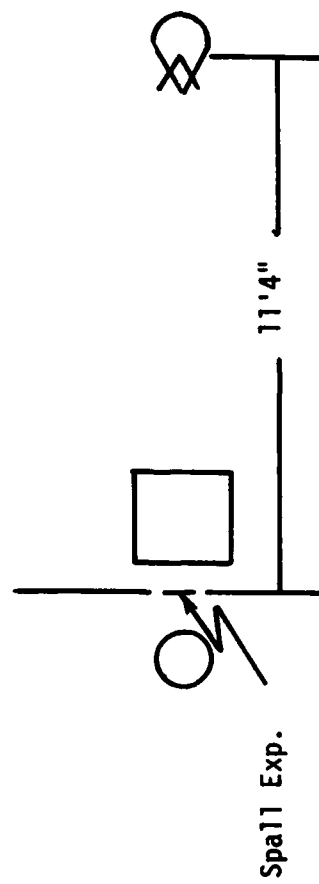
Location of Spall Experiment at 10 psi Station on MB-II-2.
